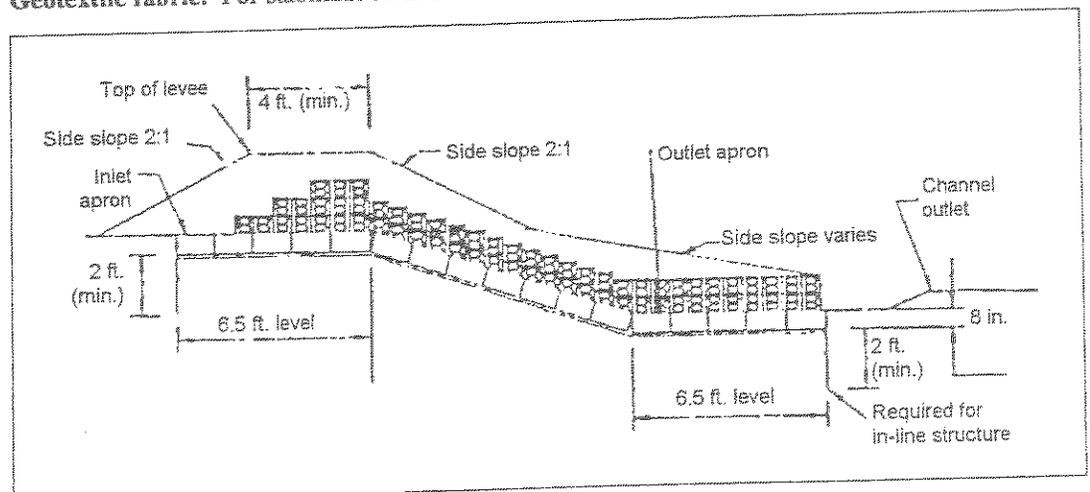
B. Detailed cross-sectional view of a concrete block chute.
